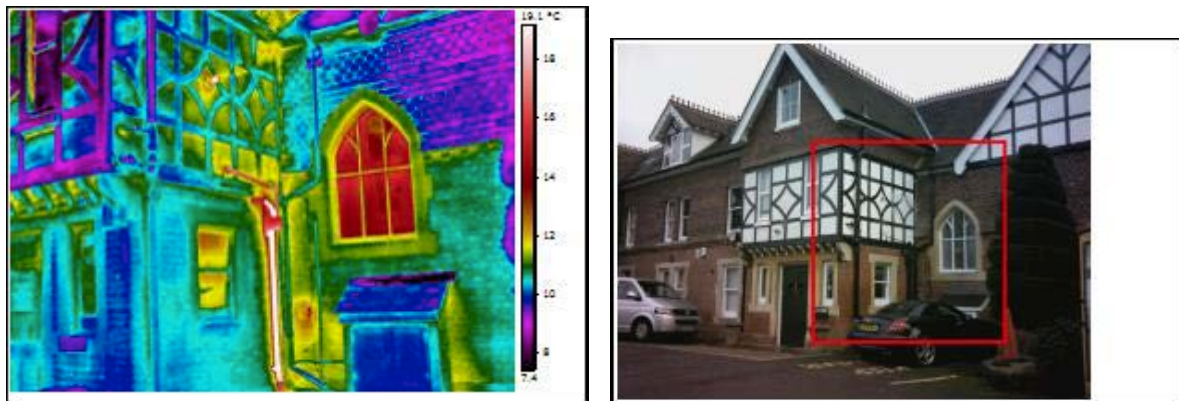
Front elevation (northwest). The image shows significant heat loss through windows and heat loss through white painted wall.
